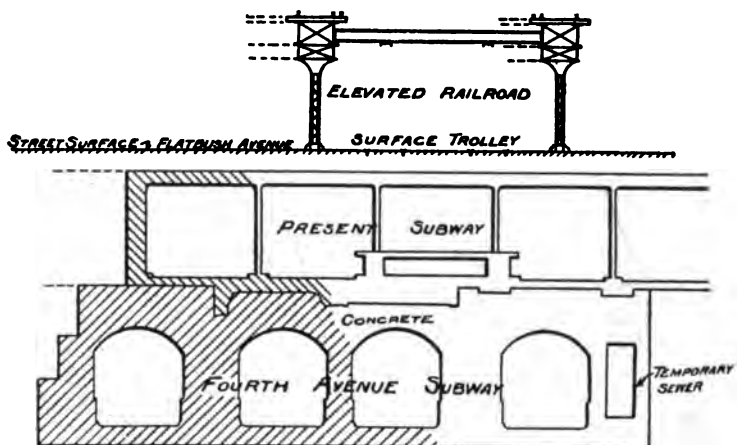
TYPICAL SECTION THROUGH SUBWAY AT TUNNEL UNDER FLATBUSH AVENUE.
